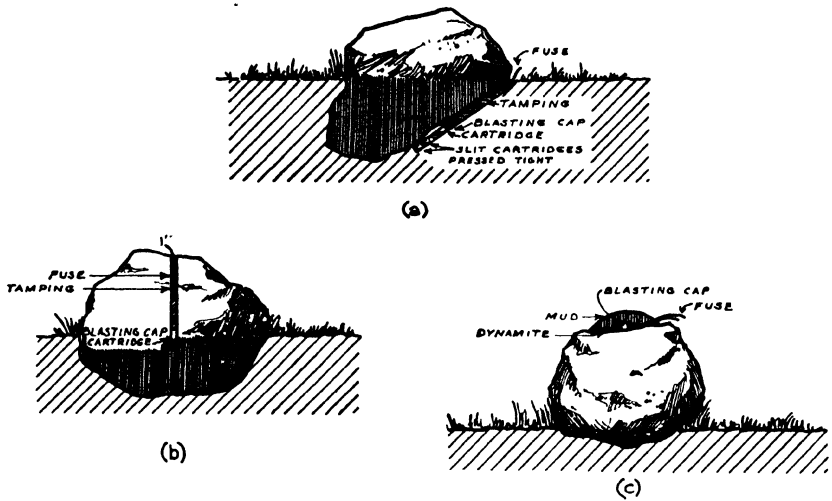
Blasting Methods. (a) snake-holing; (b) block-holing; (c) mudcapping.
